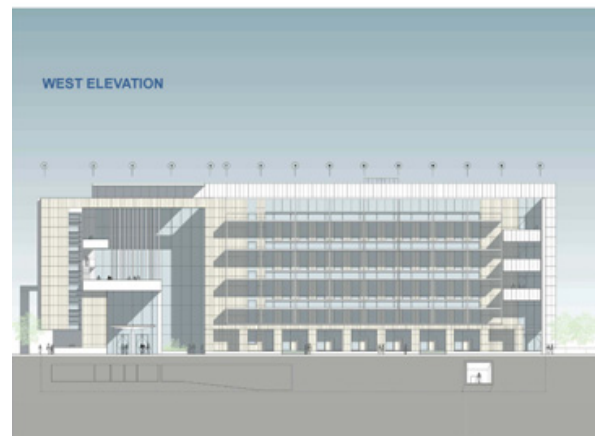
West Elevation Showing Laboratory Exterior and Atrium/Entry
